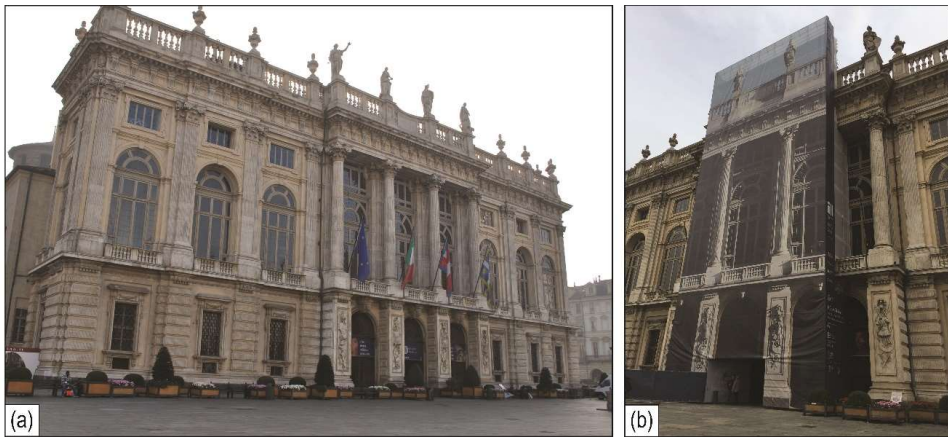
a. View of Palazzo Madama façade; b. Study site located in the central area of the façade.
